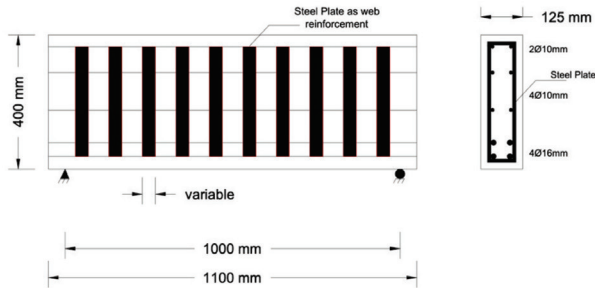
Details of self-compacting concrete deep beam with steel plate as web reinforcement
